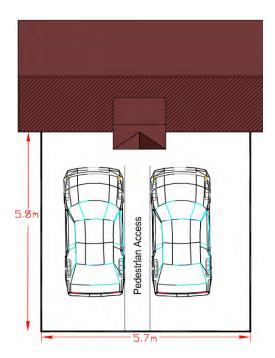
Minimum parking area dimensions in front of house wall and pedestrian access
